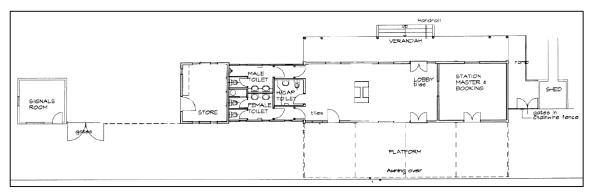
The current Station building floorplan, 2017 Byron Shire Council
